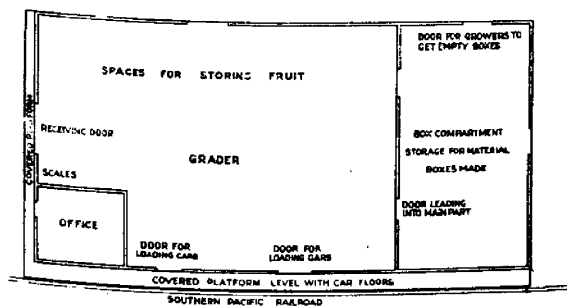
PLAN OF FRUIT PACKING HOUSE.
